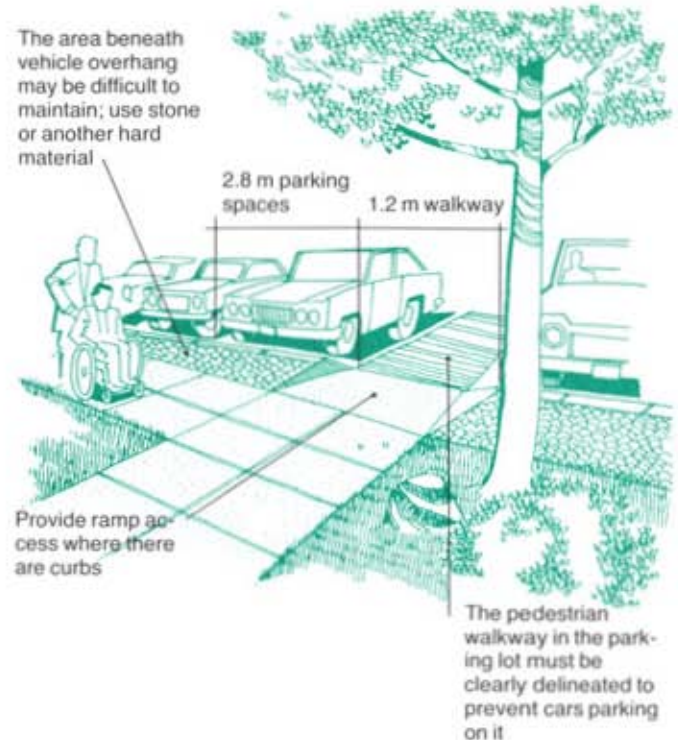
Ramps and curb cuts should be built from parking areas to sidewalks. (Source: *Barrier Free Site Design*, Washington, D.C.: U.S. Department of Housing and Urban Development, 1975).
